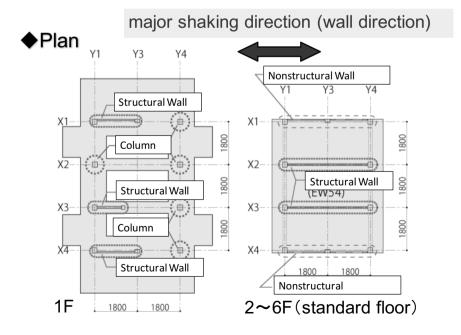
A post-1981 apartment building that collapsed at the soft first story.
